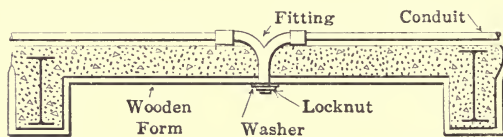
FITTING IN POSITION IN CONDUIT.
